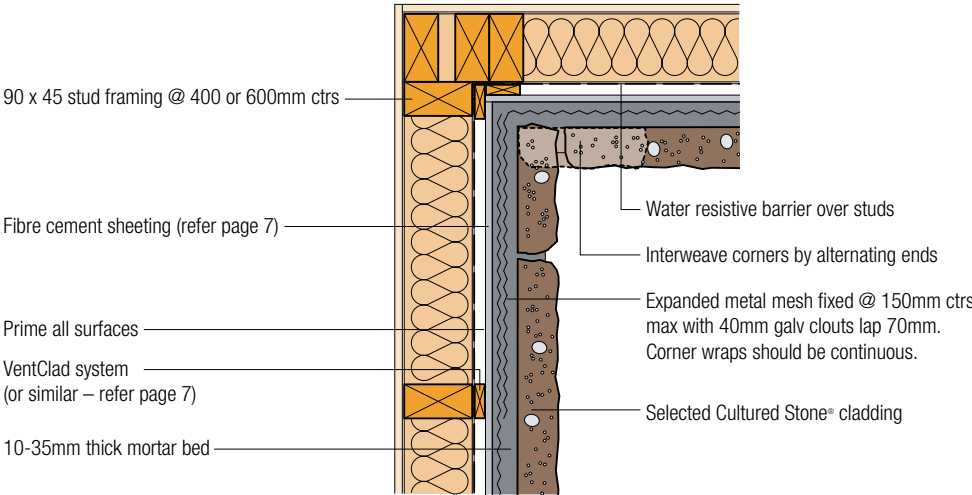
Fibre Cement Clad Typical Internal Corner - Plan (Dwg # CS-02.02)
